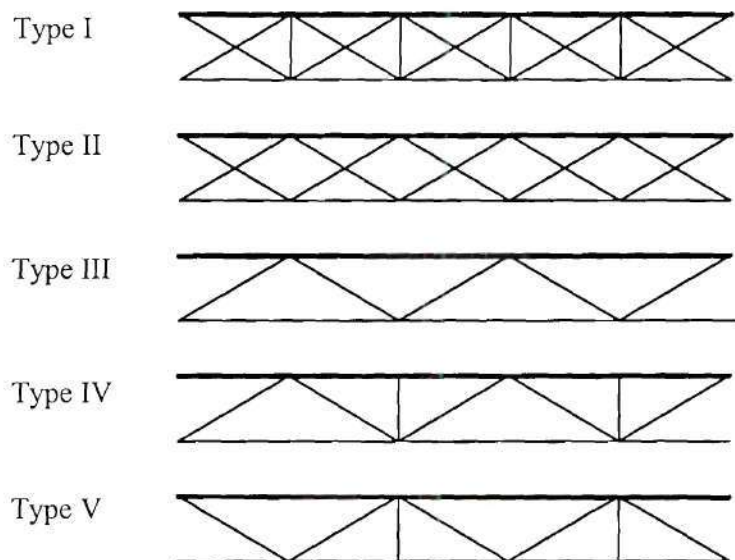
FRP bridge deck cross section types considered by Plecnik and co-workers
